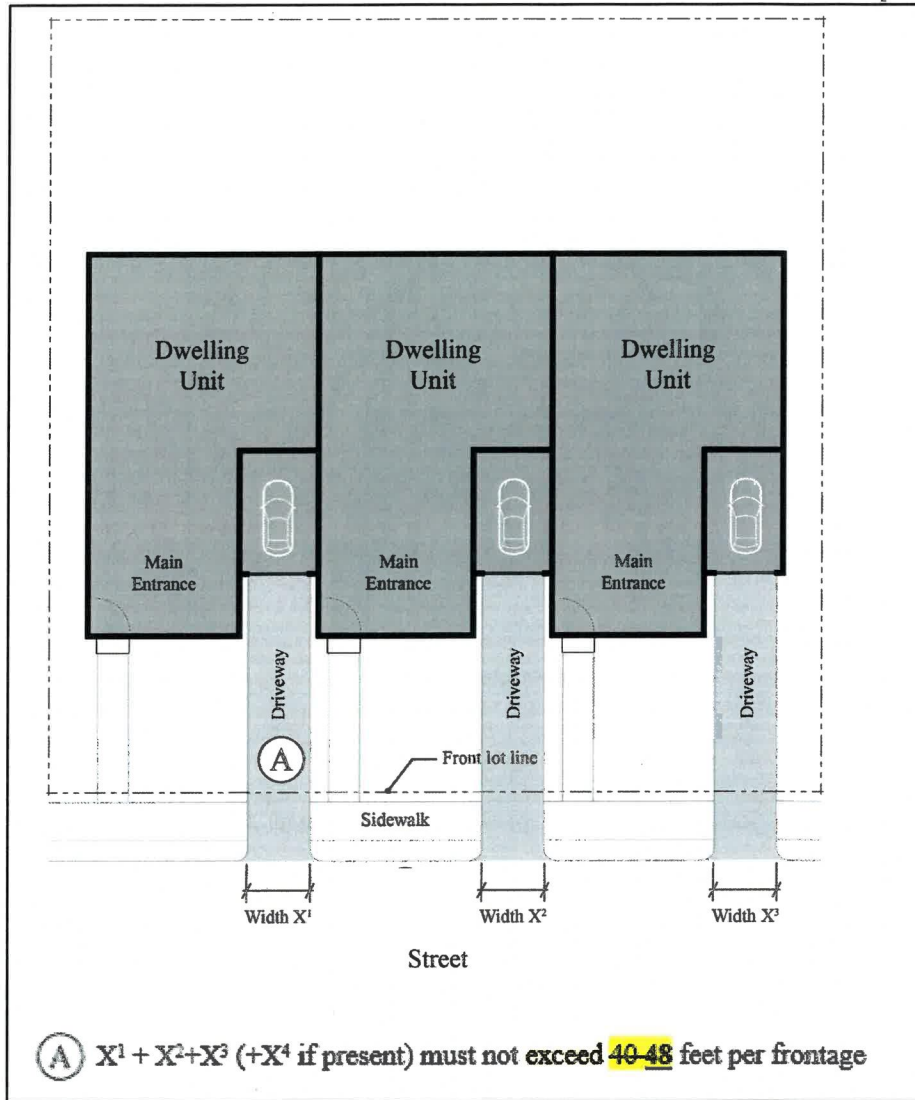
Triplex and Fourplex: Driveway Approach Width
